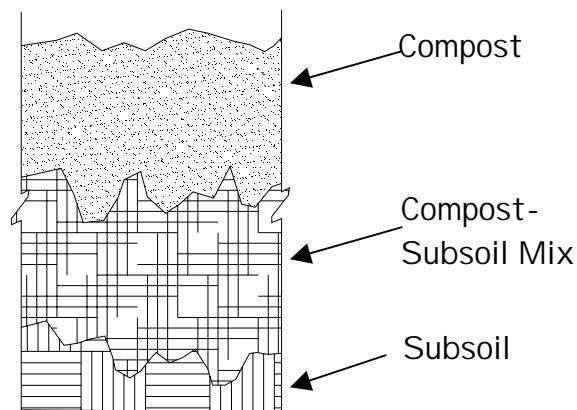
Soil Profile After Tilling to Mix Soil Layers
